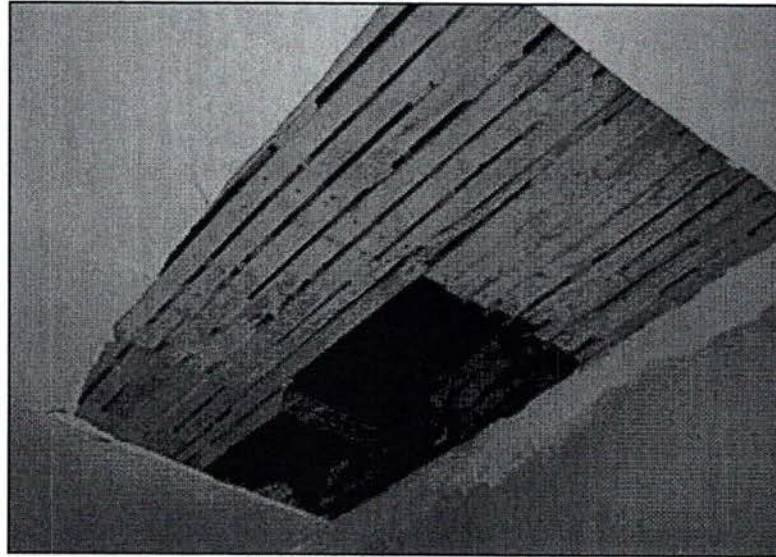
Drywall cut away at ceiling in Room 204 revealing that the drywall has been installed over the original lath.
